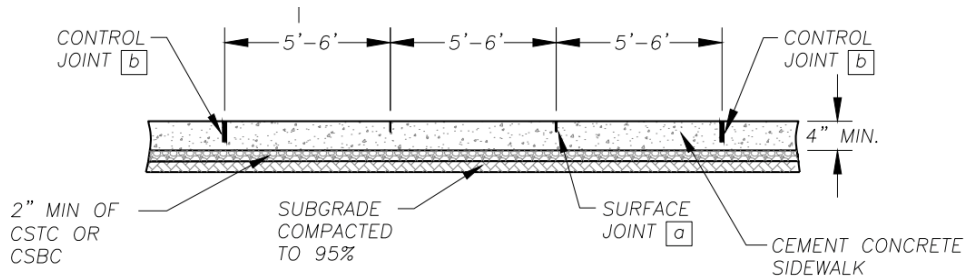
Basic installation requirements of a concrete sidewalk (Government of Clark County, 2019)
